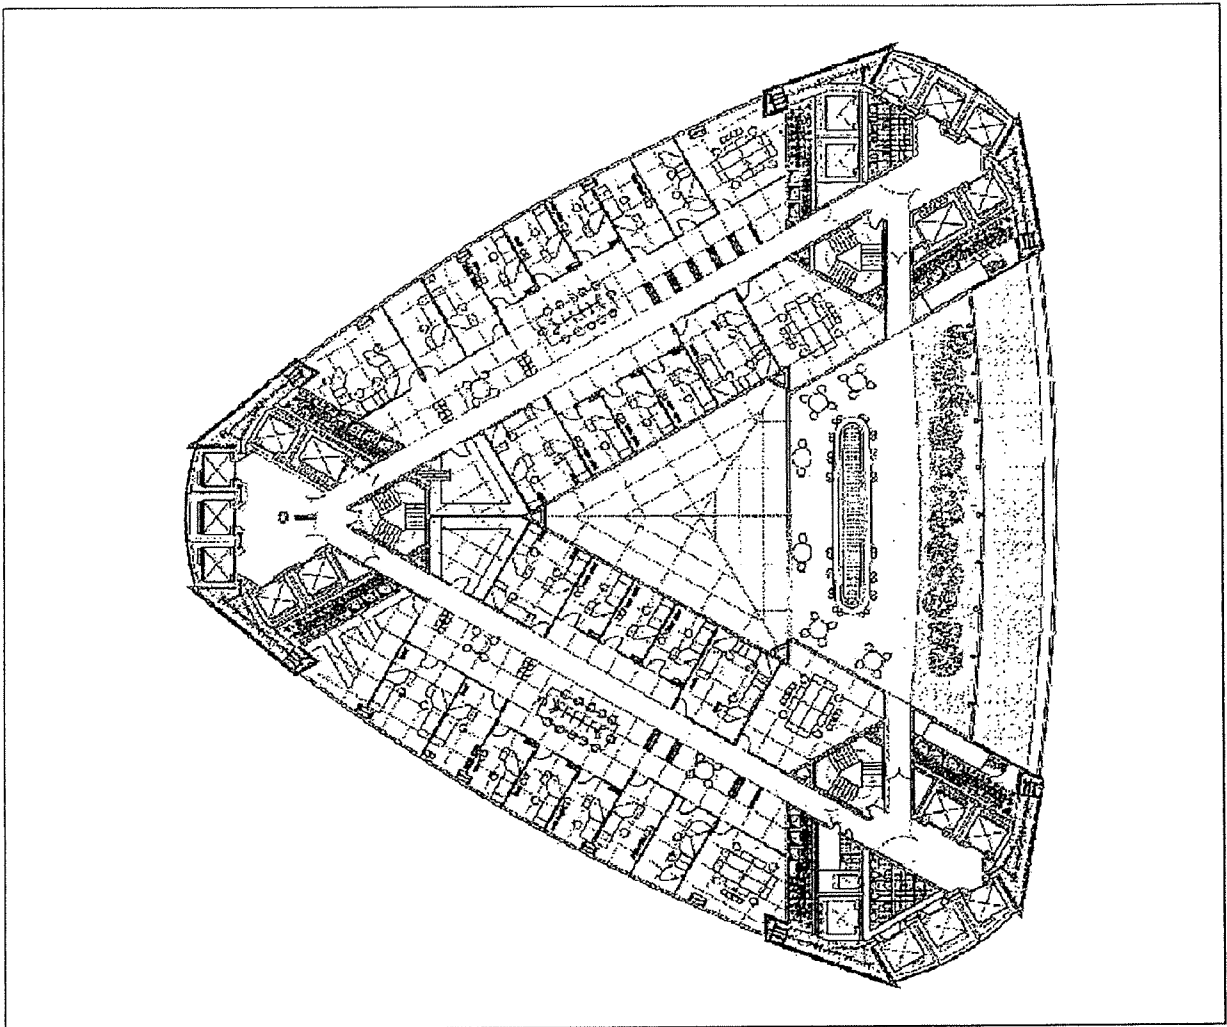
June 1992; Typical Floor with Primary and two Secondary Elevator Lobbies
